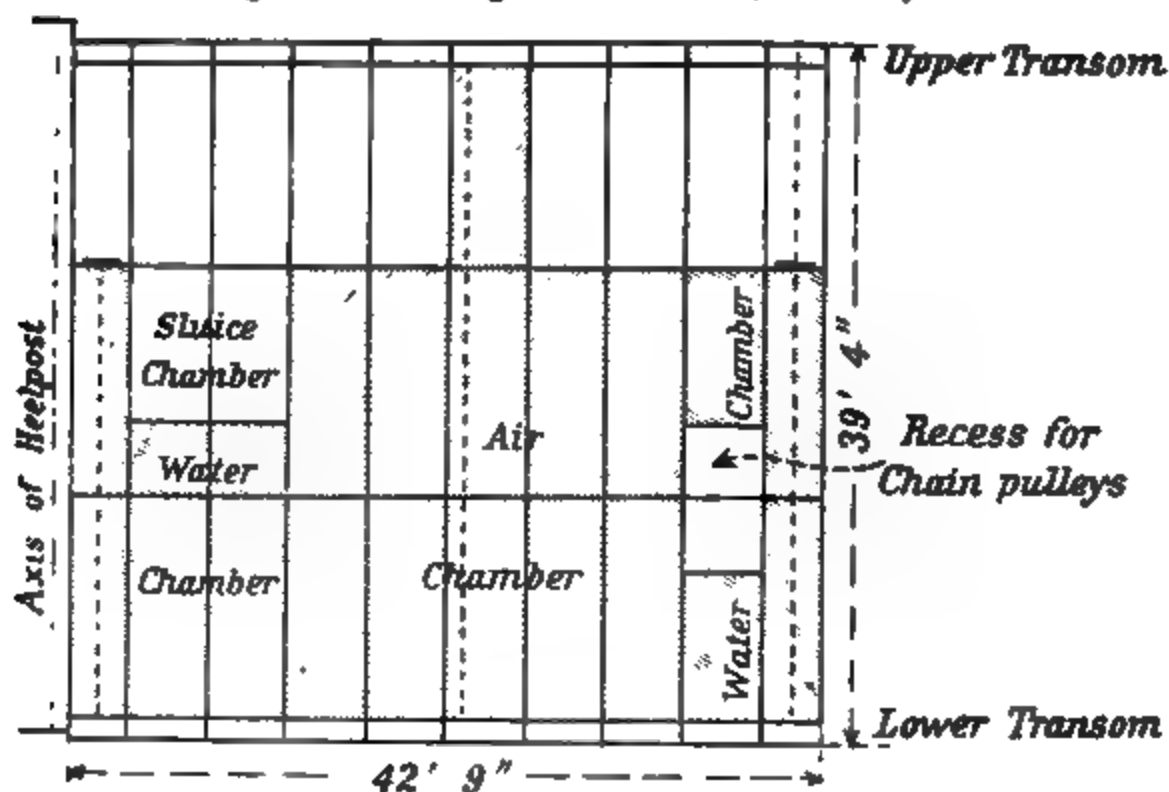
Elevation of Dock Gate at Dunkirk.
